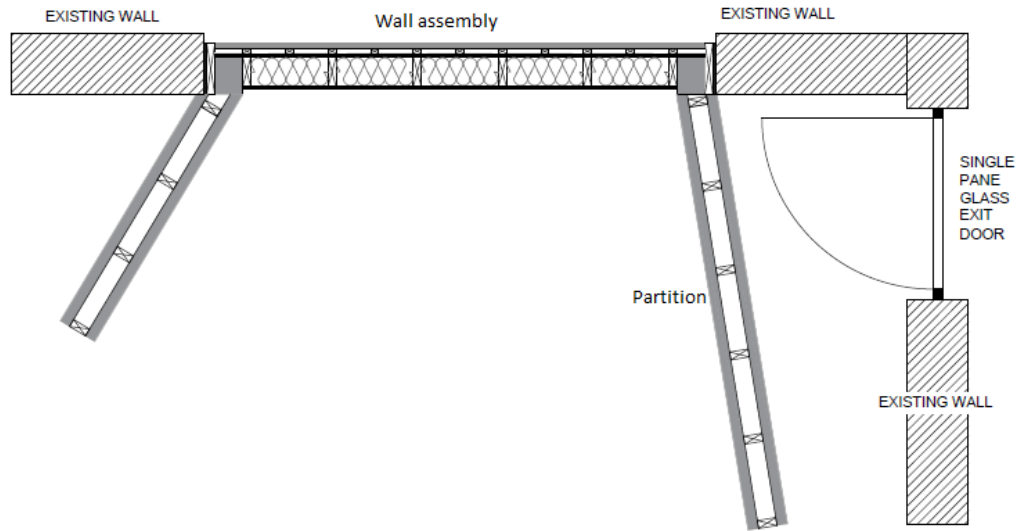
Plan view of the lab layout. (Credit: Omid T.)
